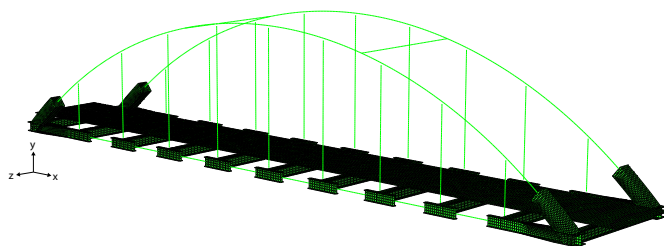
The bridge modelled in level 3. The deck and beams modelled using shell elements.
